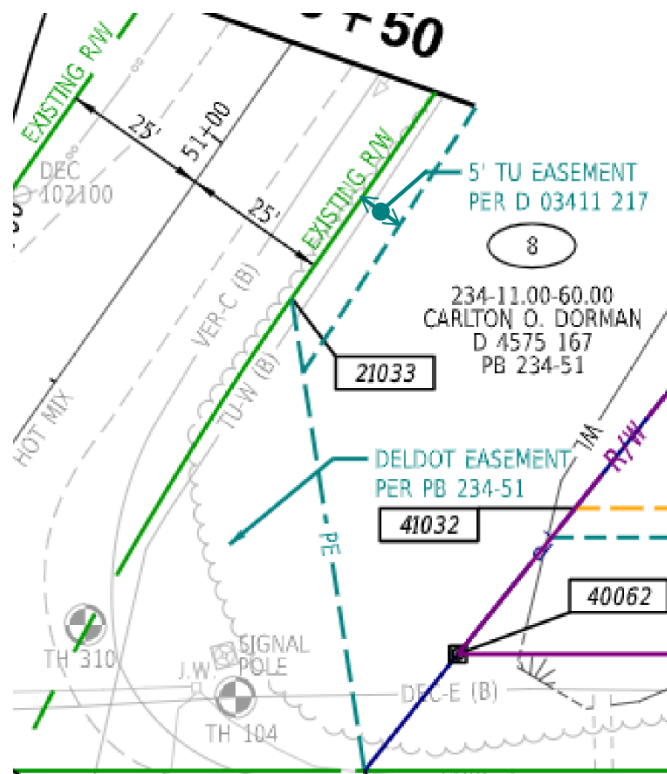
Example of existing DelDOT and existing Tidewater Utility (TU) Easement labels
